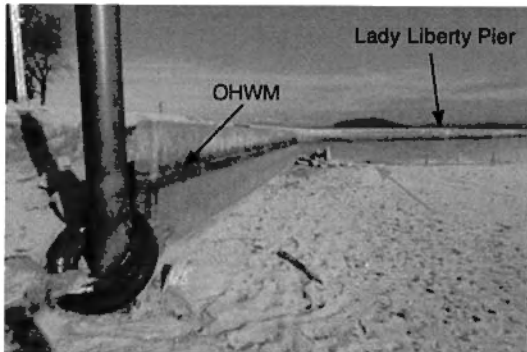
View of south side of shoreline (angled portion) of the pier to main pier (view northeast). OHWM evident (black arrow). Angled wall leaning waterward (though piling is also leaning in opposite direction). Erosion at red arrow.
